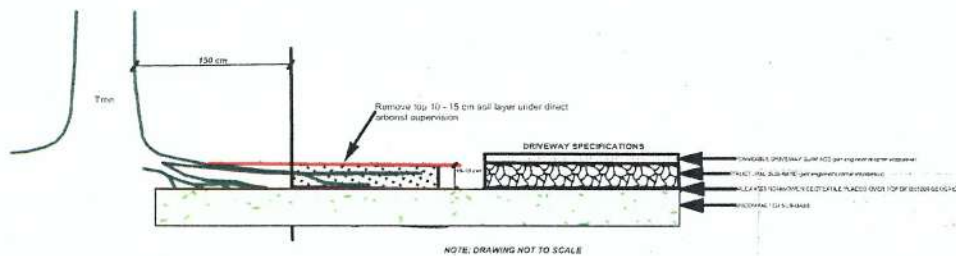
Cross-section detail of driveway and parking construction within sensitive tree areas
